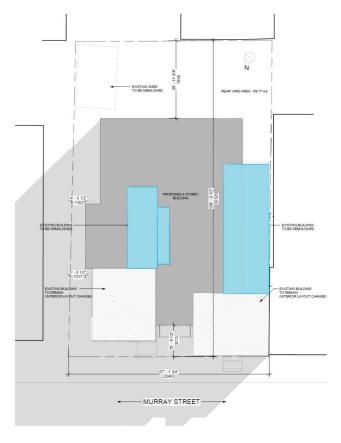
Preliminary site plan of the proposed development. The footprints of the existing buildings have a floor plate of approximately 500sq.ft. (48msq.). Note the relationship of the building at 168 Murray with the adjacent two-storey row house, illustrating the development footprint. The two existing buildings are rendered in light grey, and the rear sections that will be demolished are in blue. The 4-storey apartment block appears as a darker grey.
